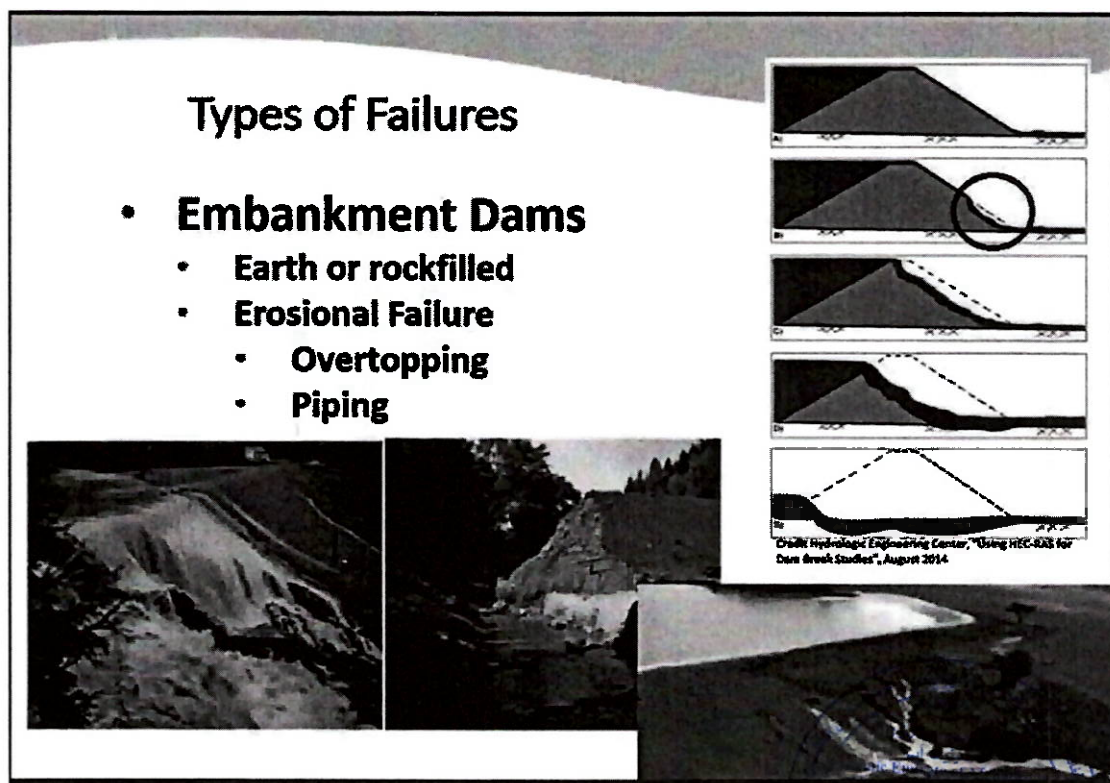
Embankment dam failure modes (overtopping, and piping are the most important ones)
